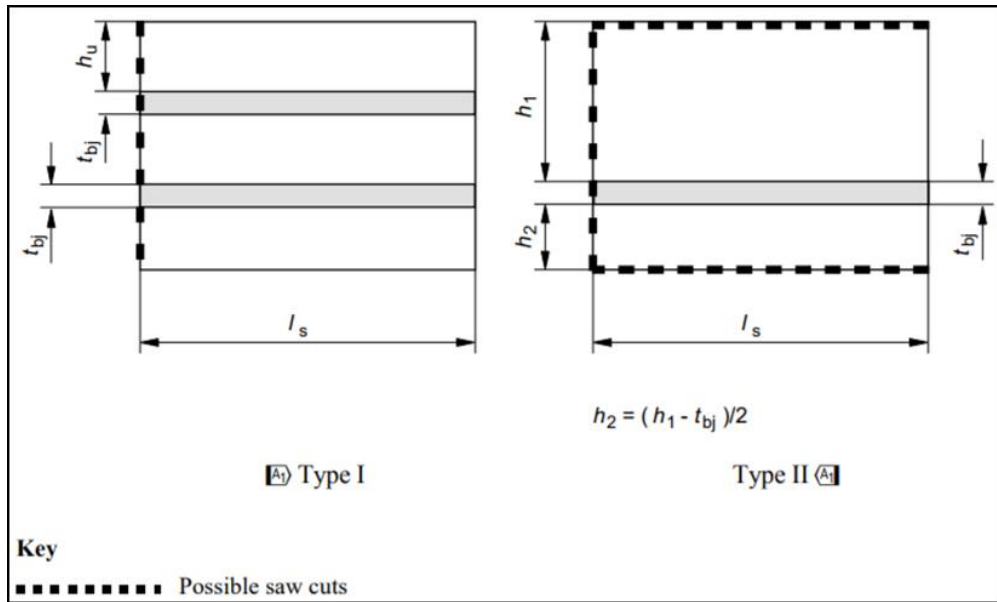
Dimensions of shear test specimen (EN 1052 – 3).
